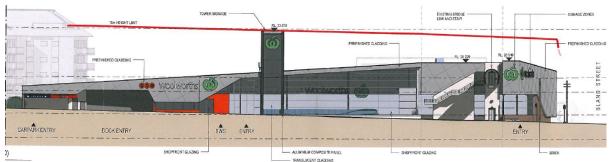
Approved Parramatta Road elevation of DA No. 10.2014.7.
